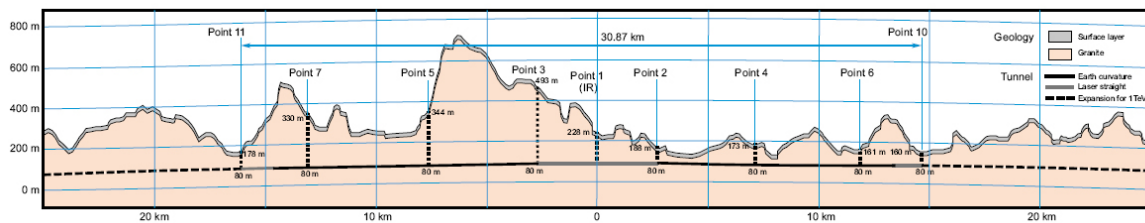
Longitudinal profile of the Asian Sample Site in Japan.
